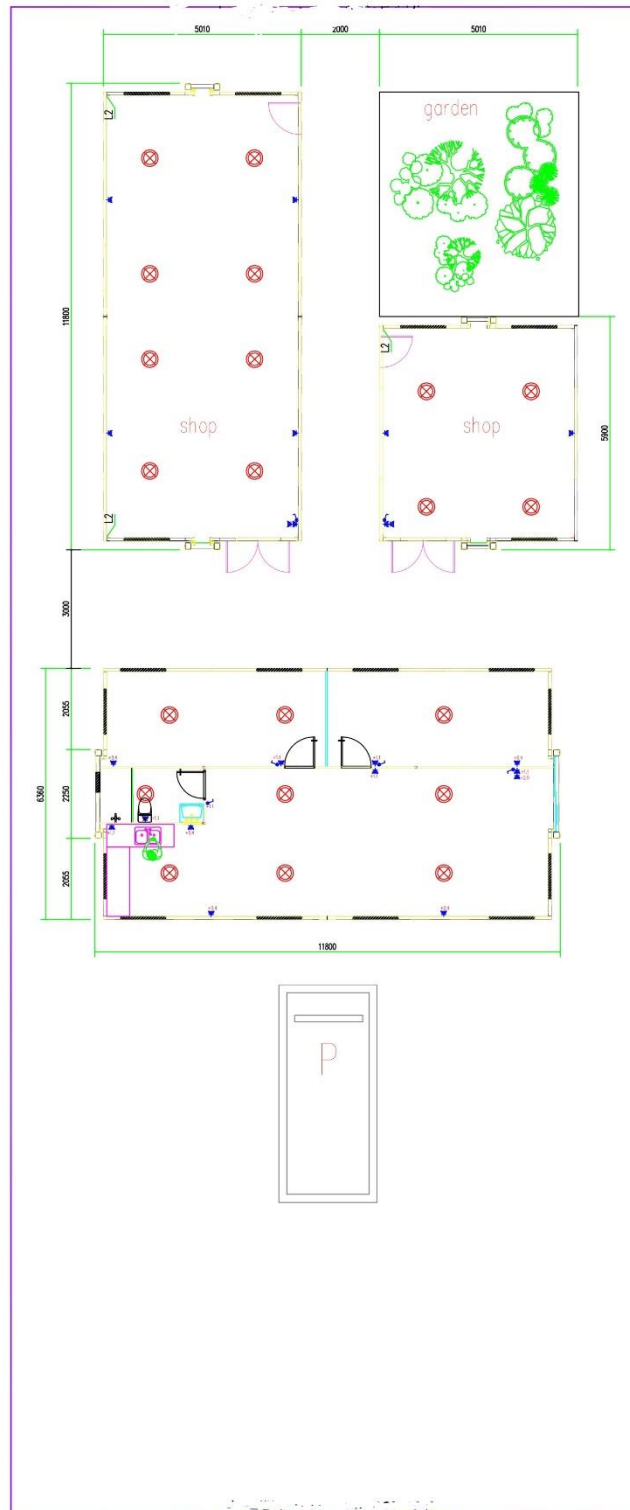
Proposed Floor Plans New Dwelling & Shops 40A- 40B Reid St Wilcannia
